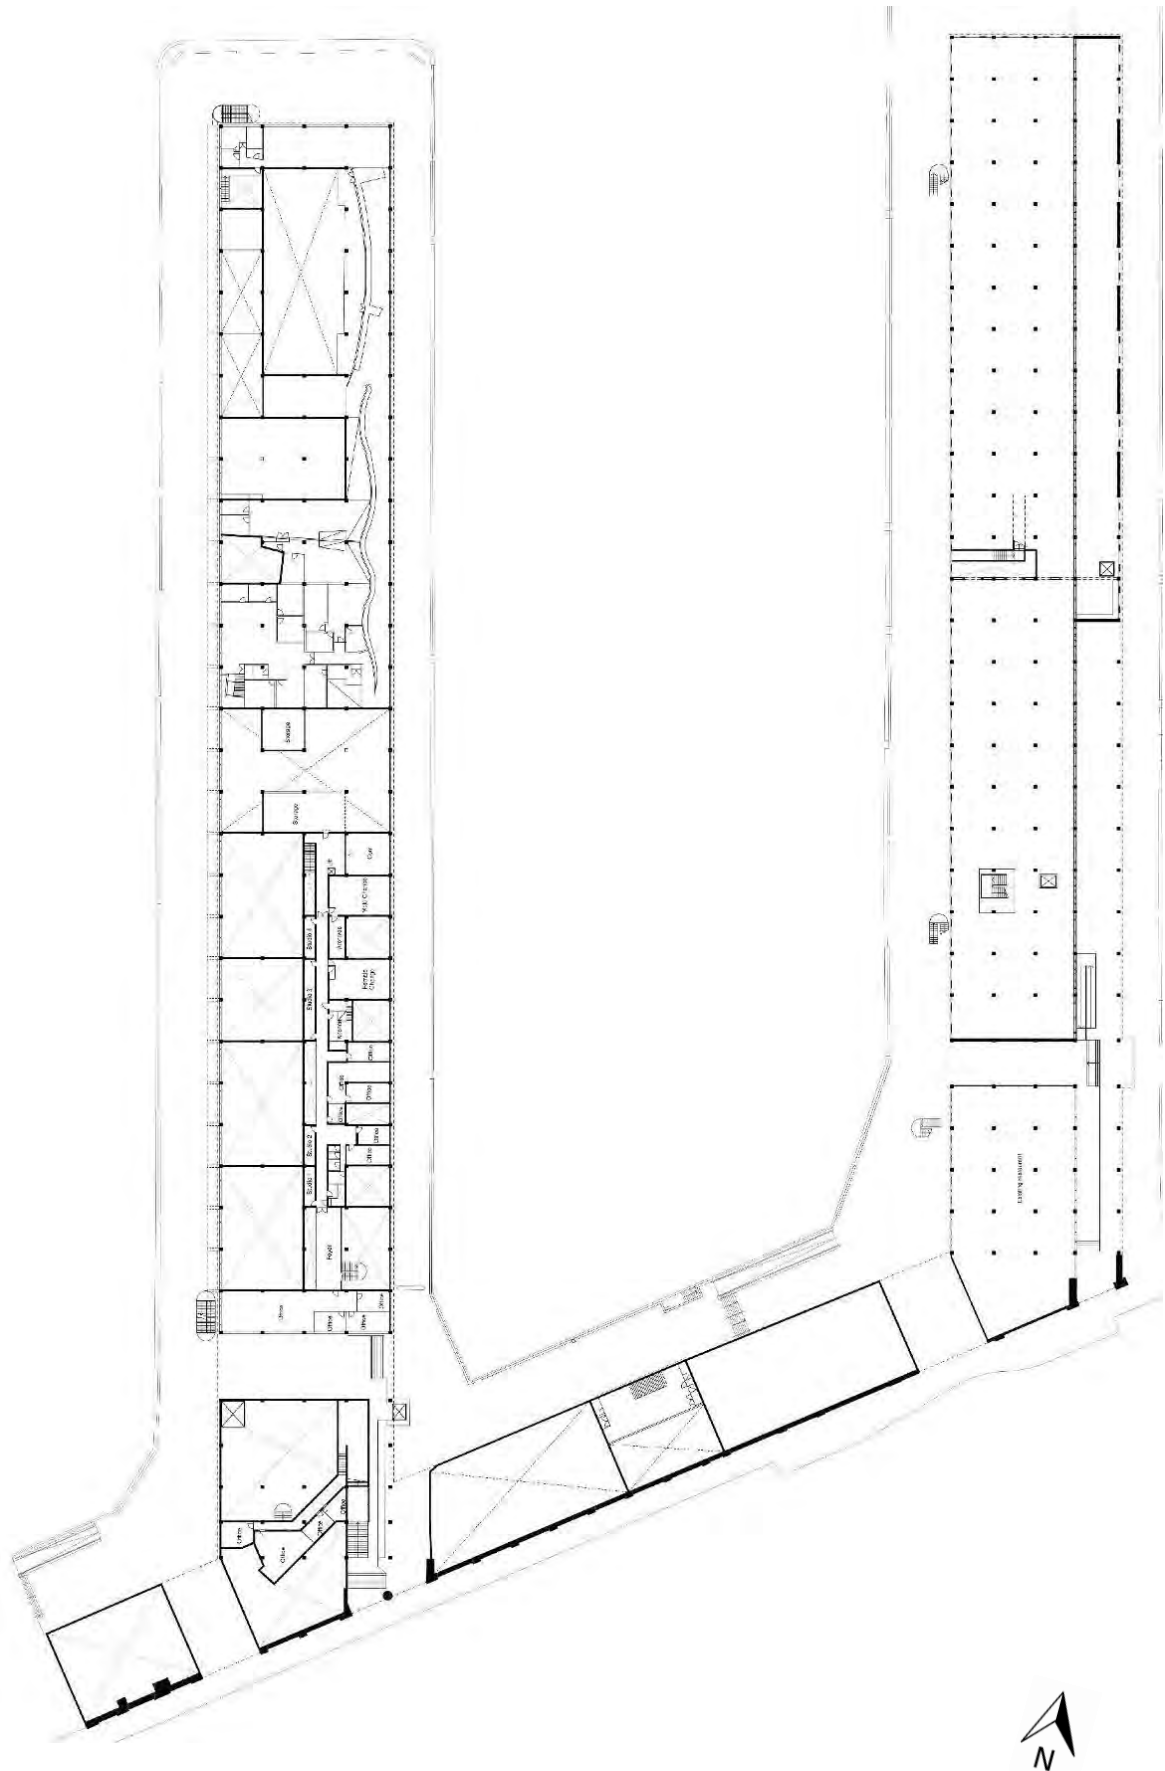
Existing Mezzanine Level Plan. Resource from TZG Architects.
